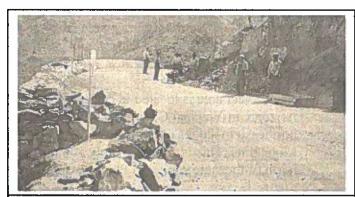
1937 stone retaining wall construction (Clements 2003)
